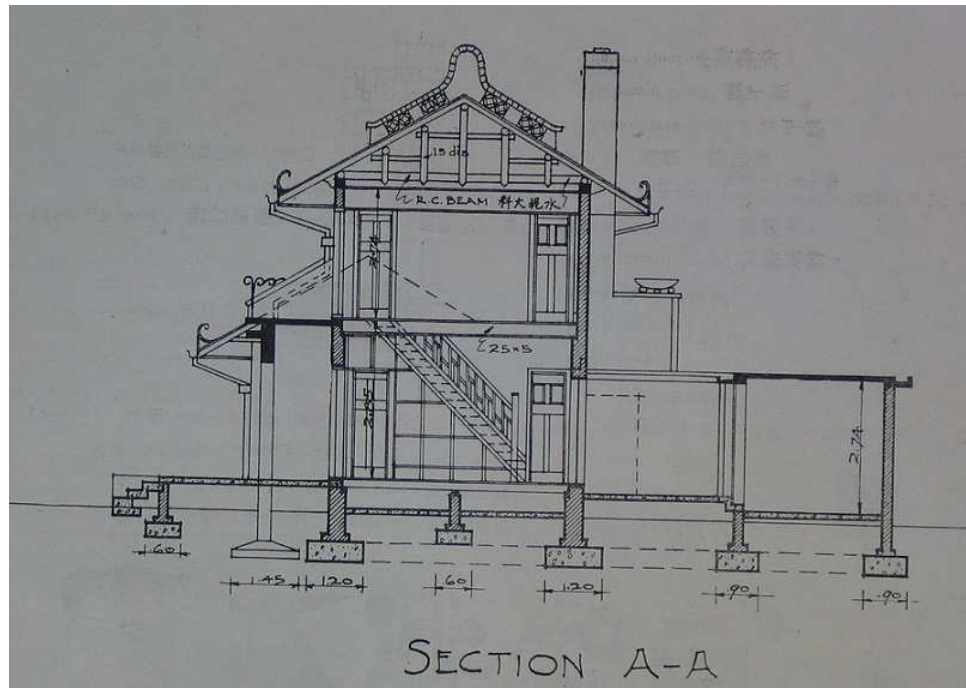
Section of the same house showing reinforced concrete as beam (Source, *ibid*, 63)
